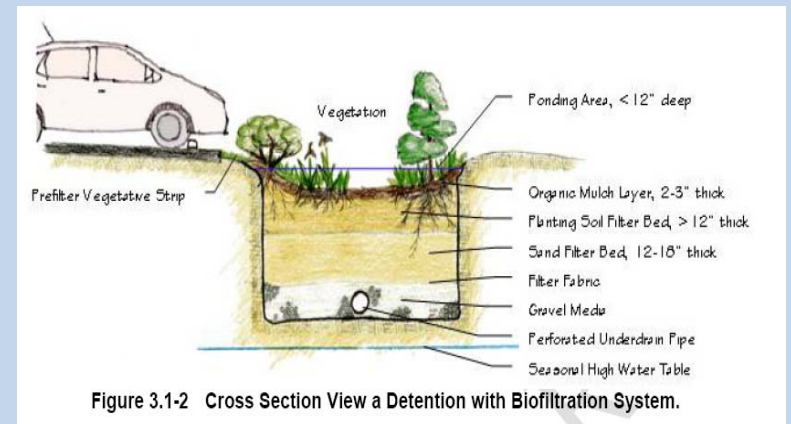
Cross Section View a Detention with Biofiltration System.
